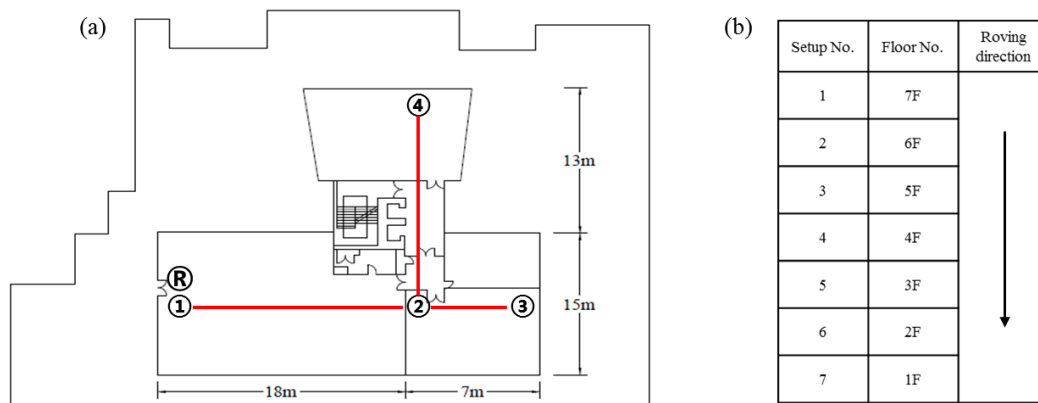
(a) Floor plan and sensor locations; (b) setup plan.
